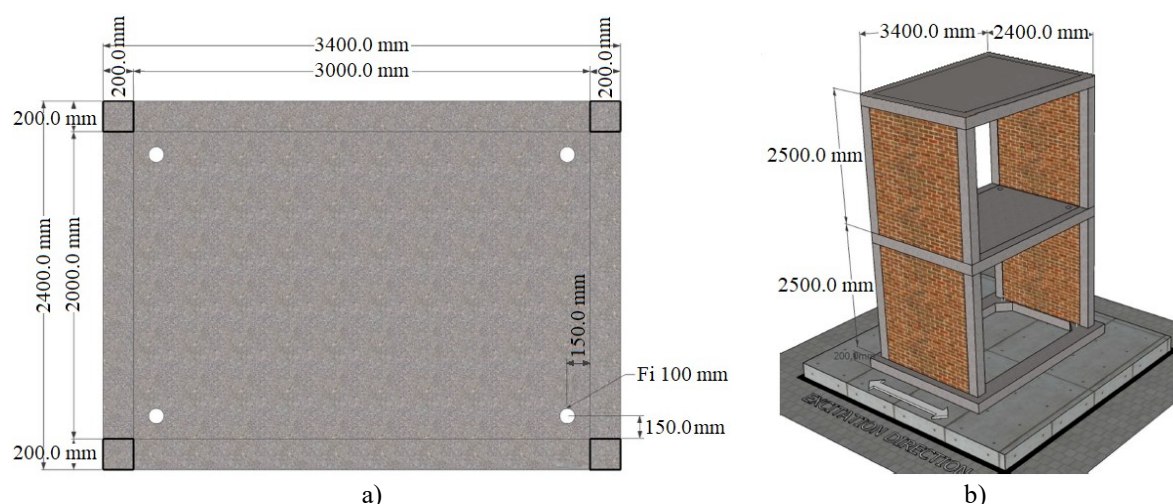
a) Building plan view, b) Building 3D view (RCF2)
